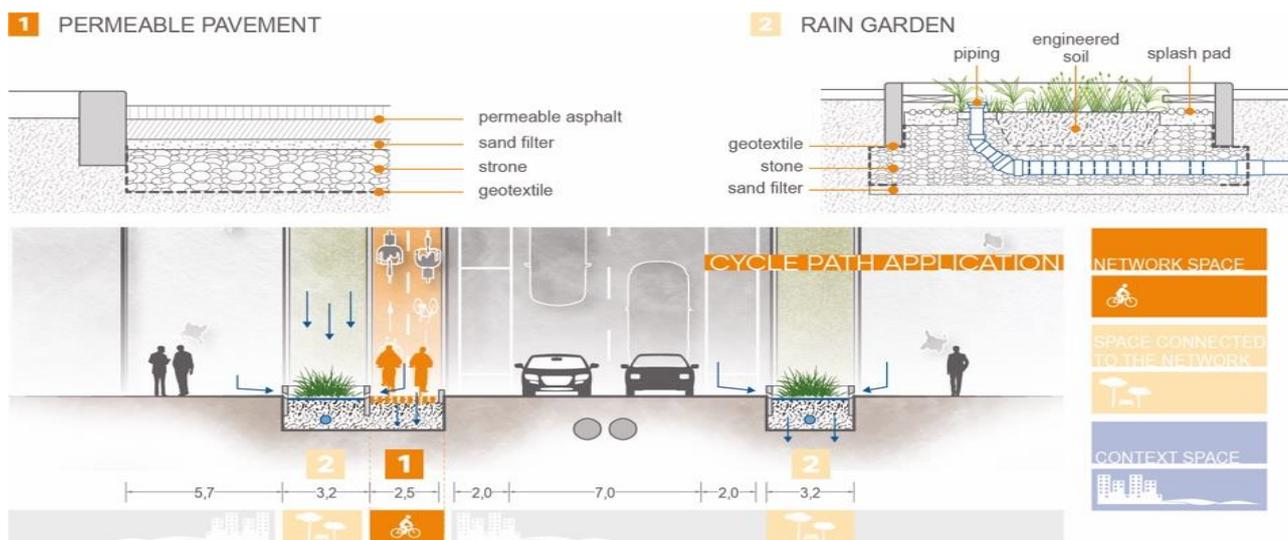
Philadelphia, section and planimetry of Permeable Pavement and Rain Garden: a hypothesis of application to the cycle path. Original drawing by arch. Angelica Nanni.
